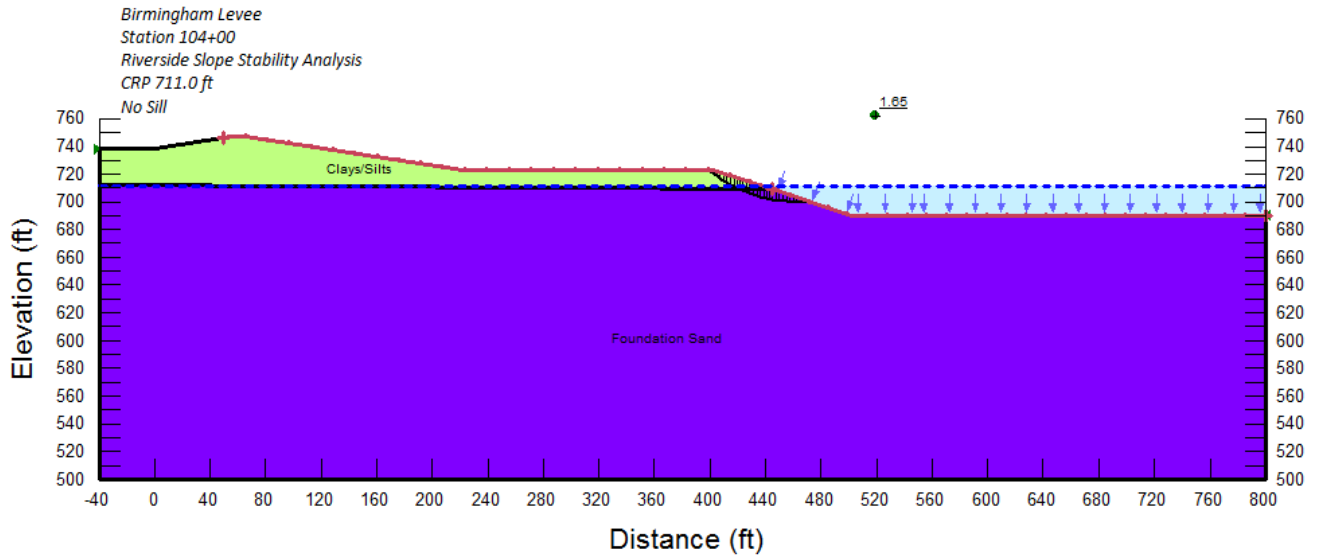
Birmingham Levee Station 104+00 Stability under Future with Project Conditions at Location between Dikes/Sills
